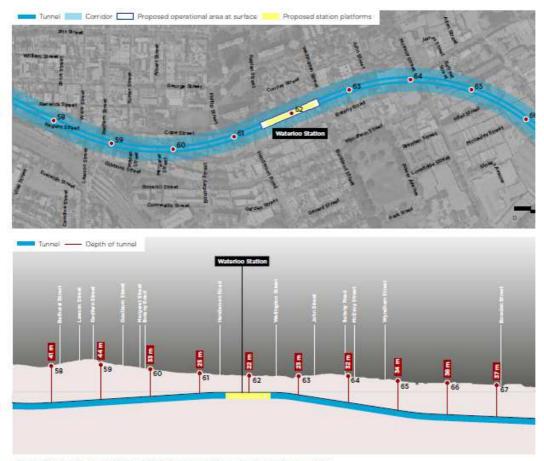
Indicative Chatswood to Sydenham alignment plan and long section
